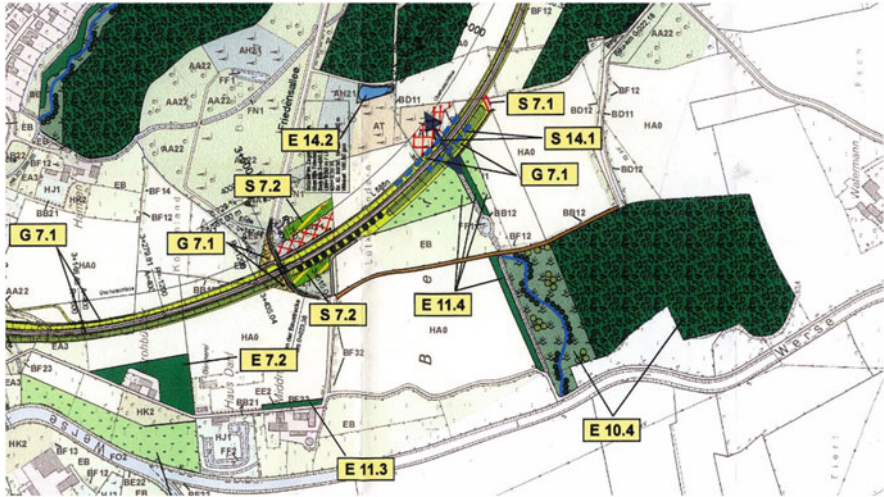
Detail of the south-west planning area (rotated) from the accompanying landscape maintenance plan (Landesbetrieb Straßenbau NRW from 29 Sept. 2003)
